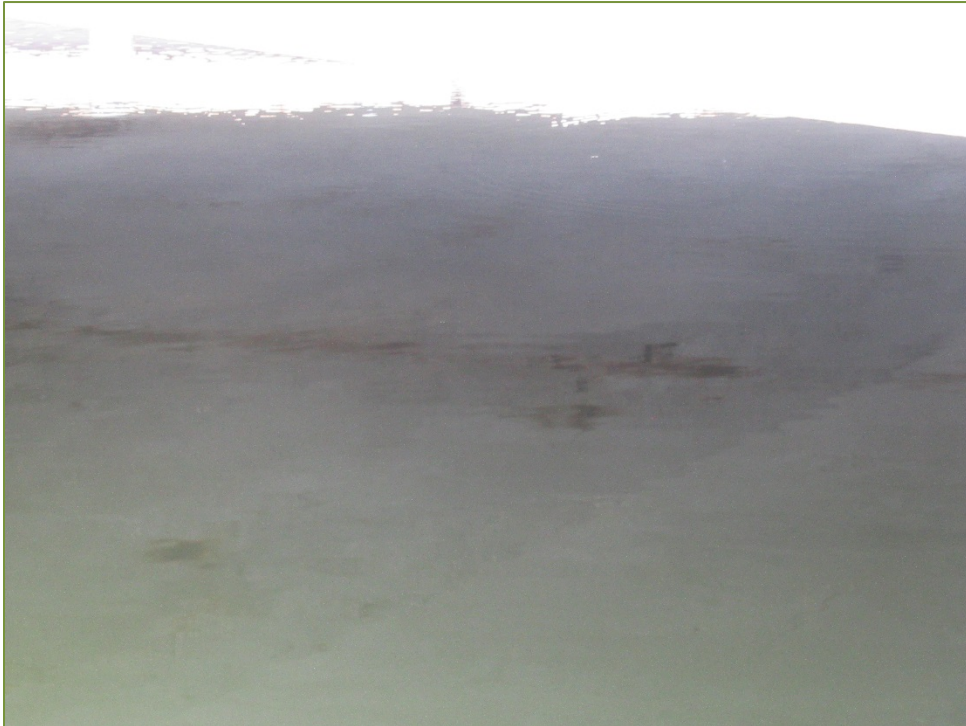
Soffit between West Abutment and Pier (fair condition - cracks, spall, delamination and wet area) note, Inaccessible
